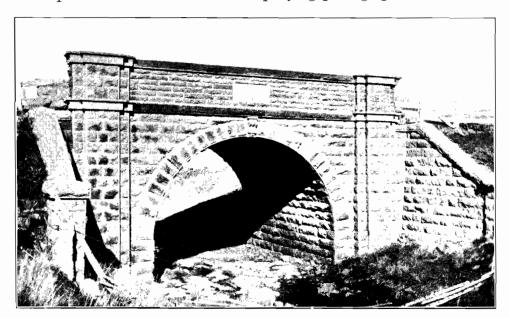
Showing stone culvert on Bendigo-road, near Gisborne, erected 1861.
